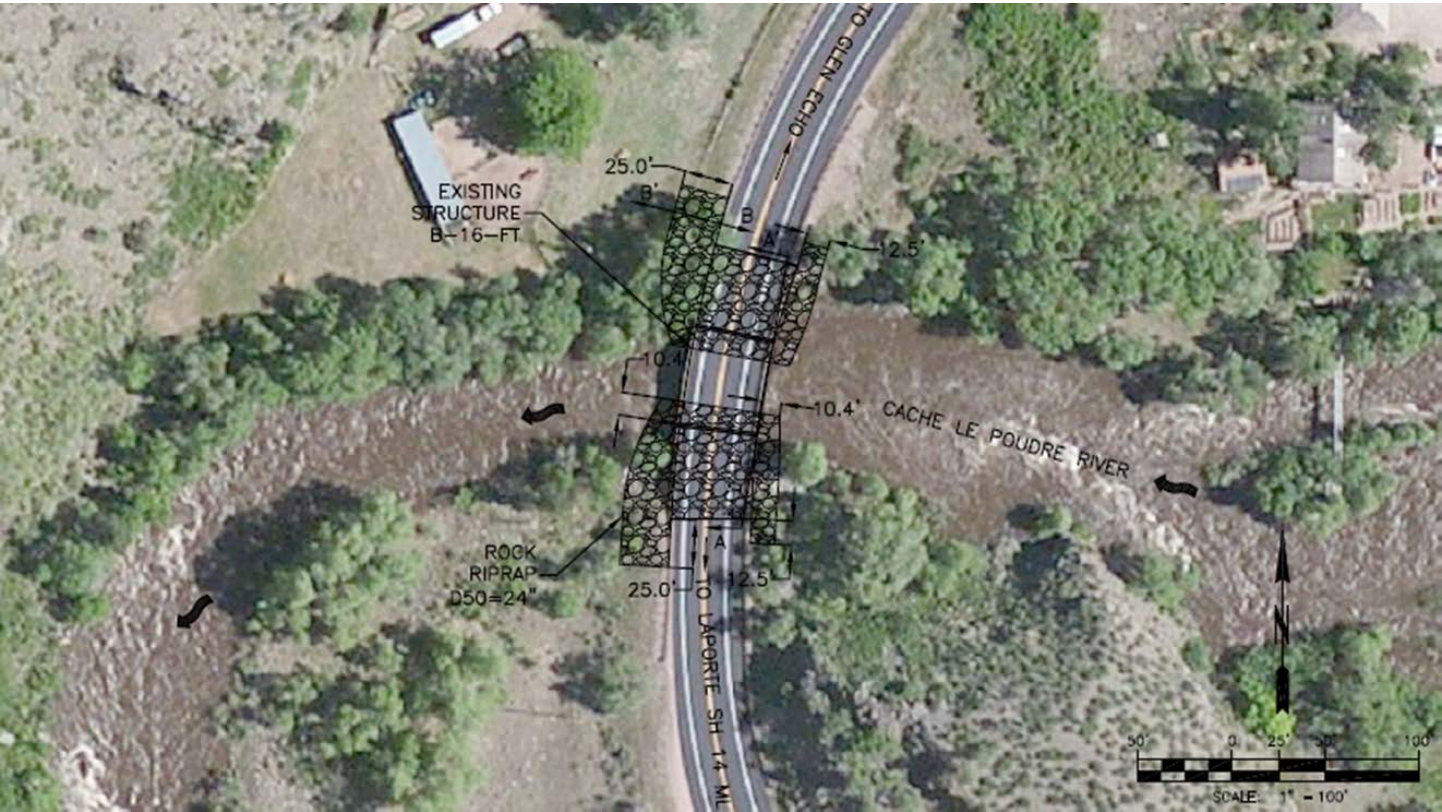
Plan view of Bridge B-16-FT with recommended hydraulic scour countermeasure locations
